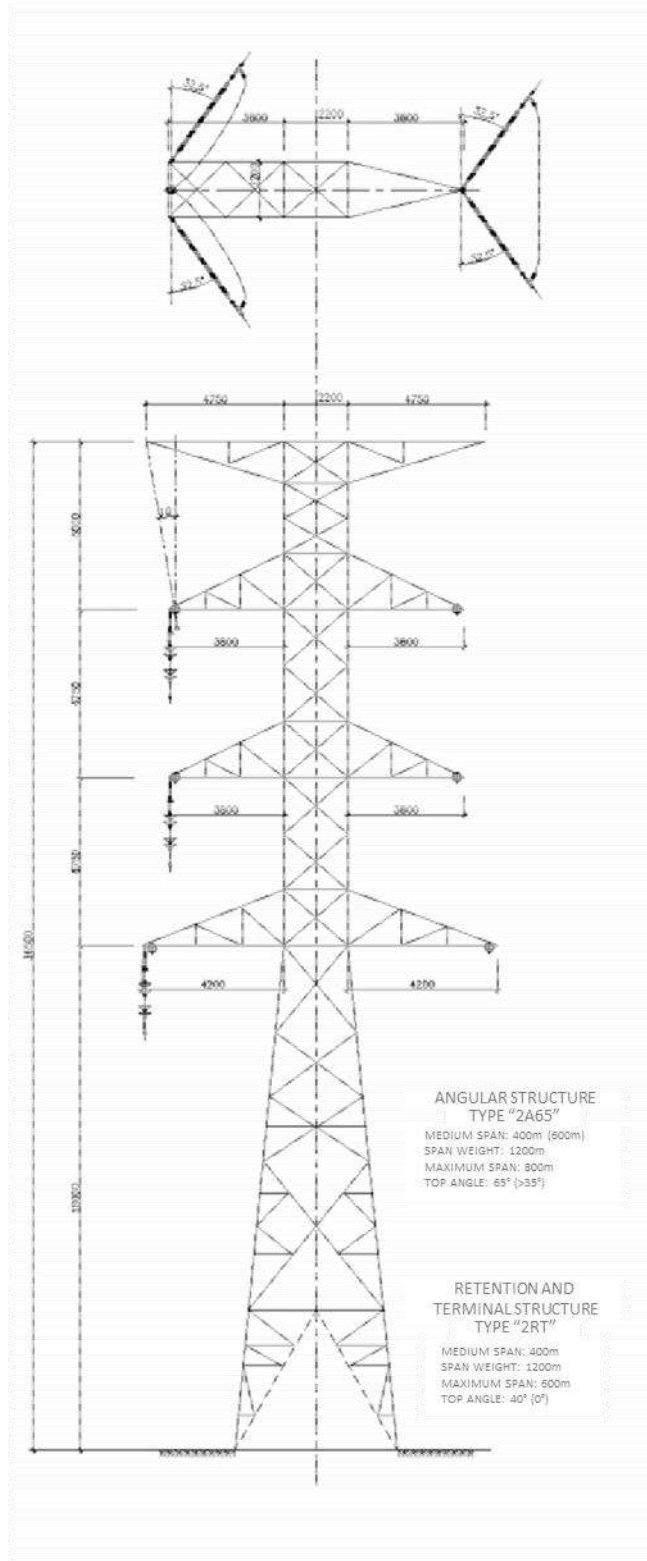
Tower 2S65 and Retention and Terminal Tower 2RT
